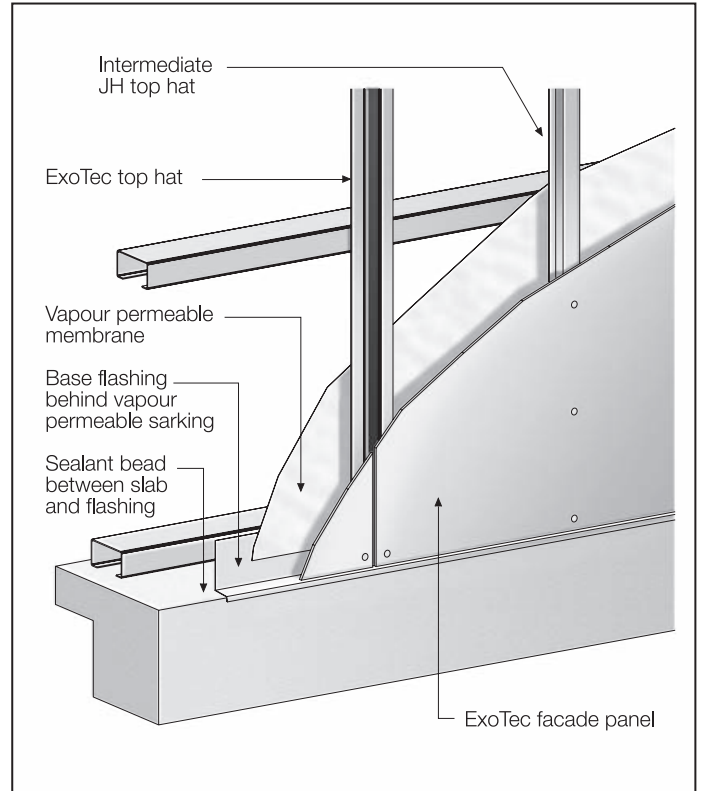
WALL BASE CUTAWAY TYPICAL DETAIL 2
